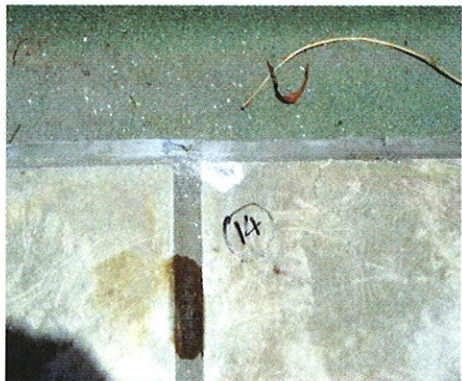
Concrete tiles, Roof of coffin crematorium building (Sample No. B/261/06/14)
